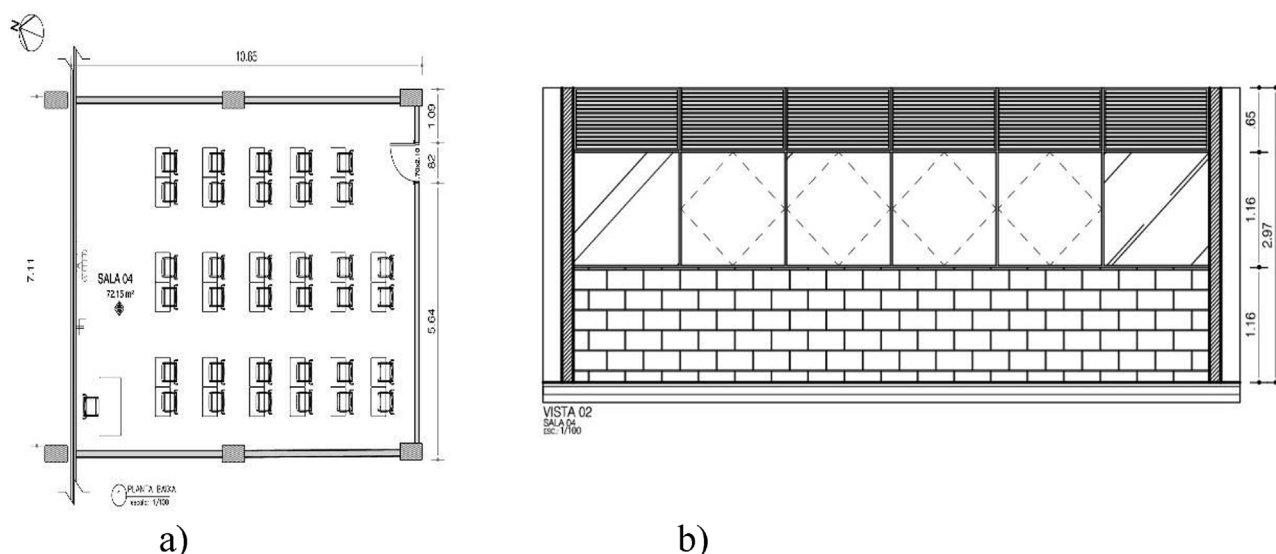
a) Floor plan of classroom A, b) Frontal view of the windows.
